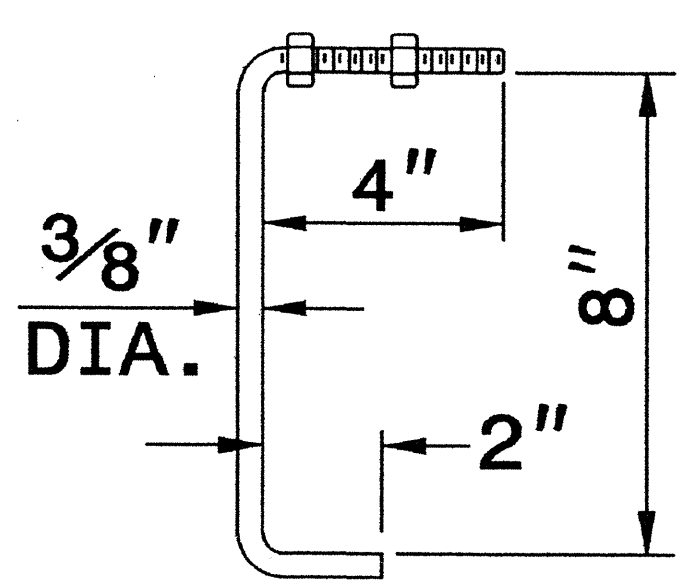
DETAIL SHOWING ANCHORAGE OF FRAME FOR GRATED DROP INLET
